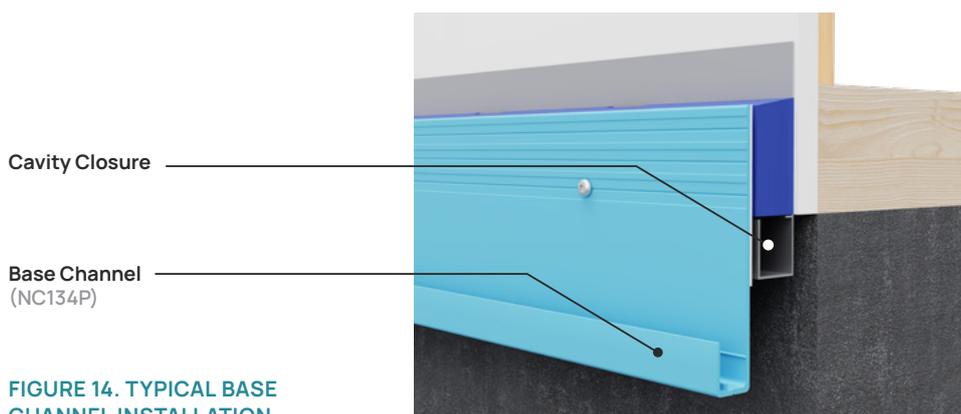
TYPICAL BASE CHANNEL INSTALLATION
